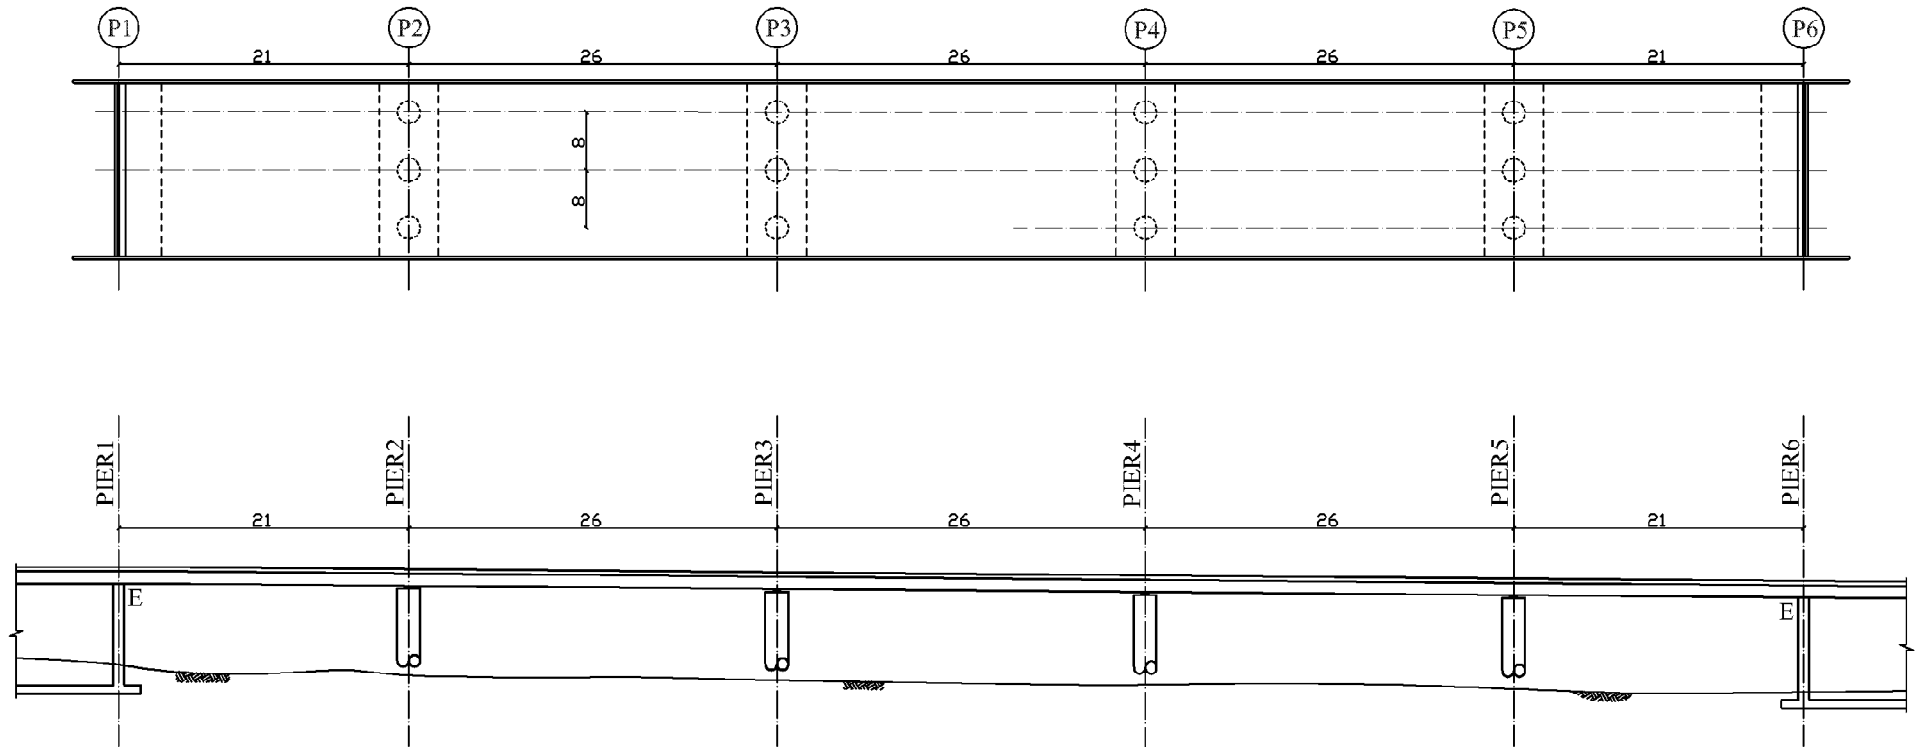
Almahata Bridge - plan & elevation, dimensions in meter (Adapted from Greater Amman Municipality).
